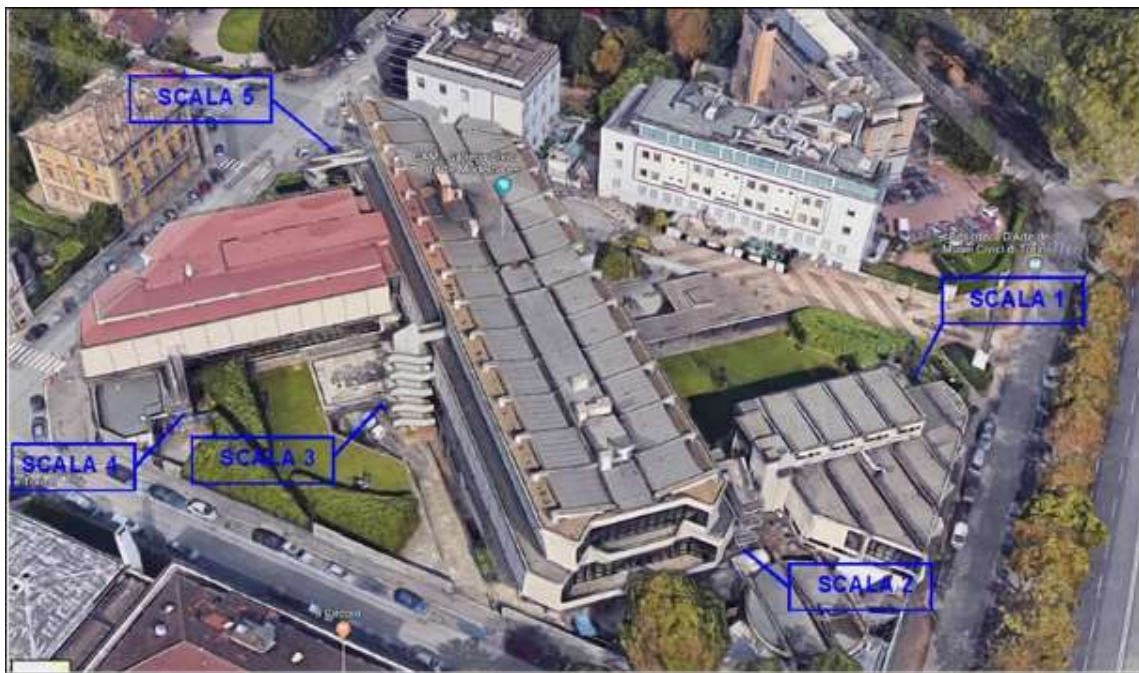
Aerial view of the GAM's five reinforced concrete outside stairs
